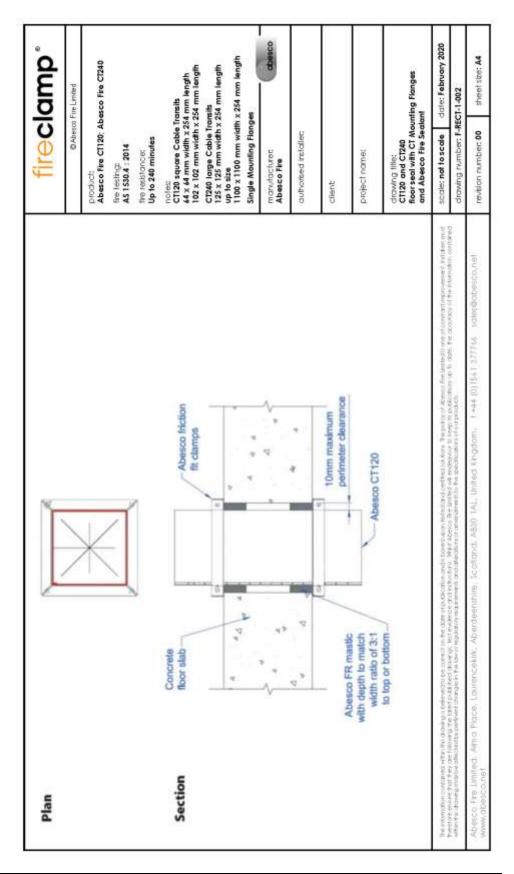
Drawing No. F-CIR-001 – CT120 Floor seal with CT mounting flanges and Abesco fire sealant
